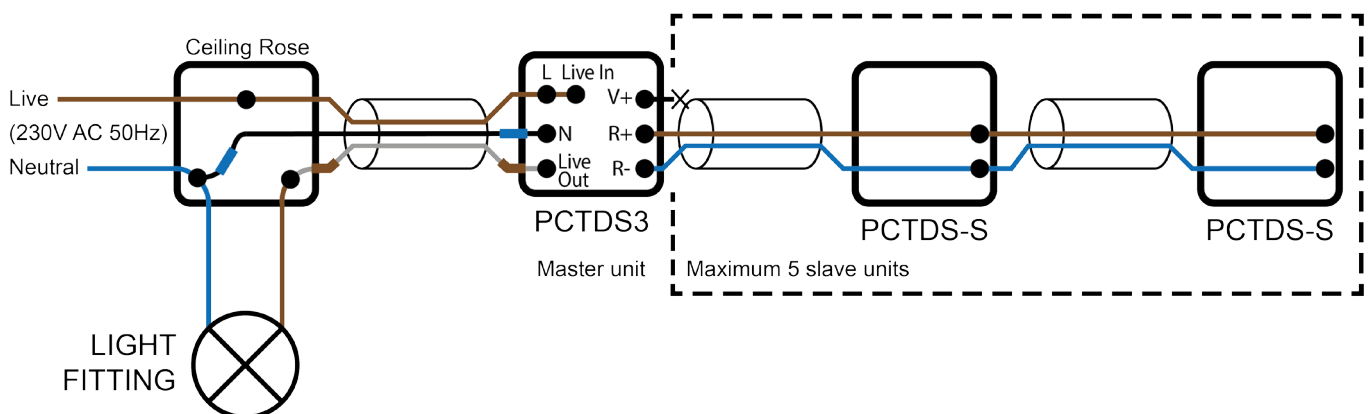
Typical ceiling rose plan using two PCTDS-S slave units
